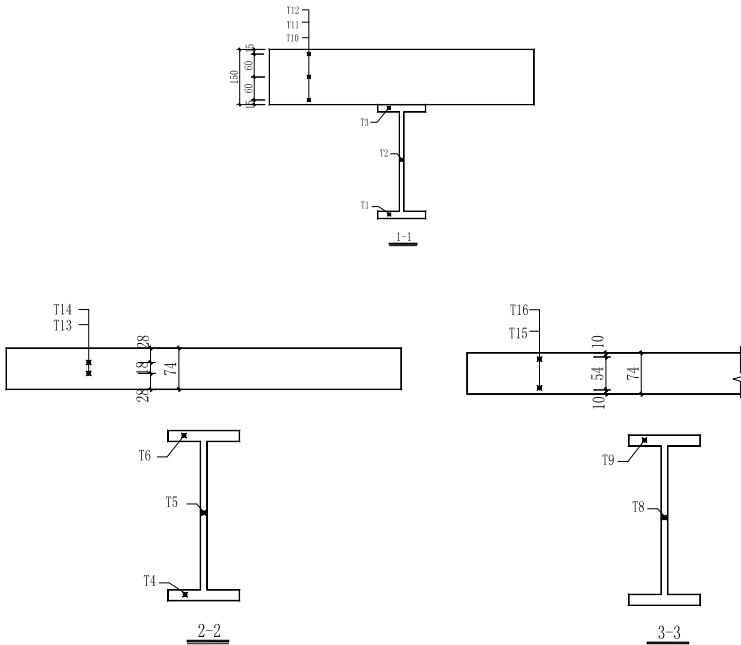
Positions of thermal couples over cross-section of specimen CB150 (mm)
